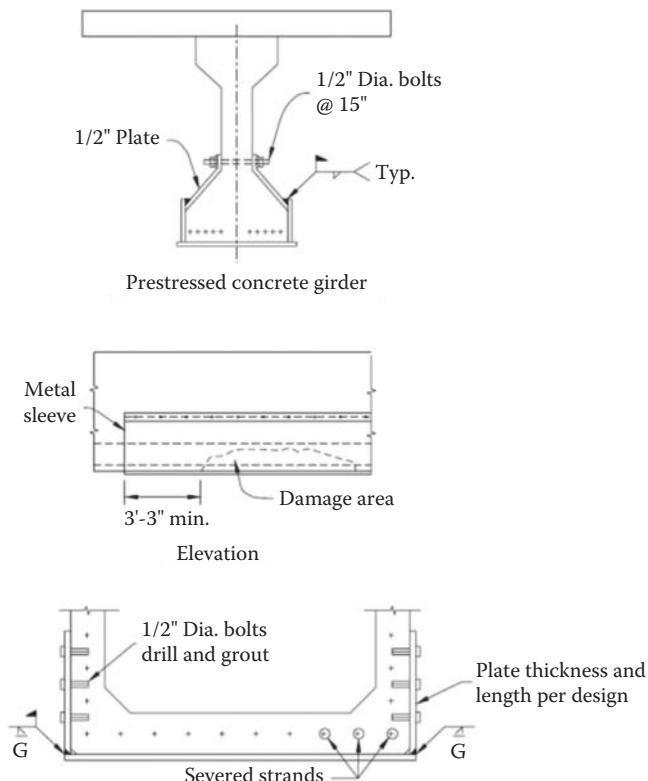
Metal sleeve splice strengthening of concrete girders.
